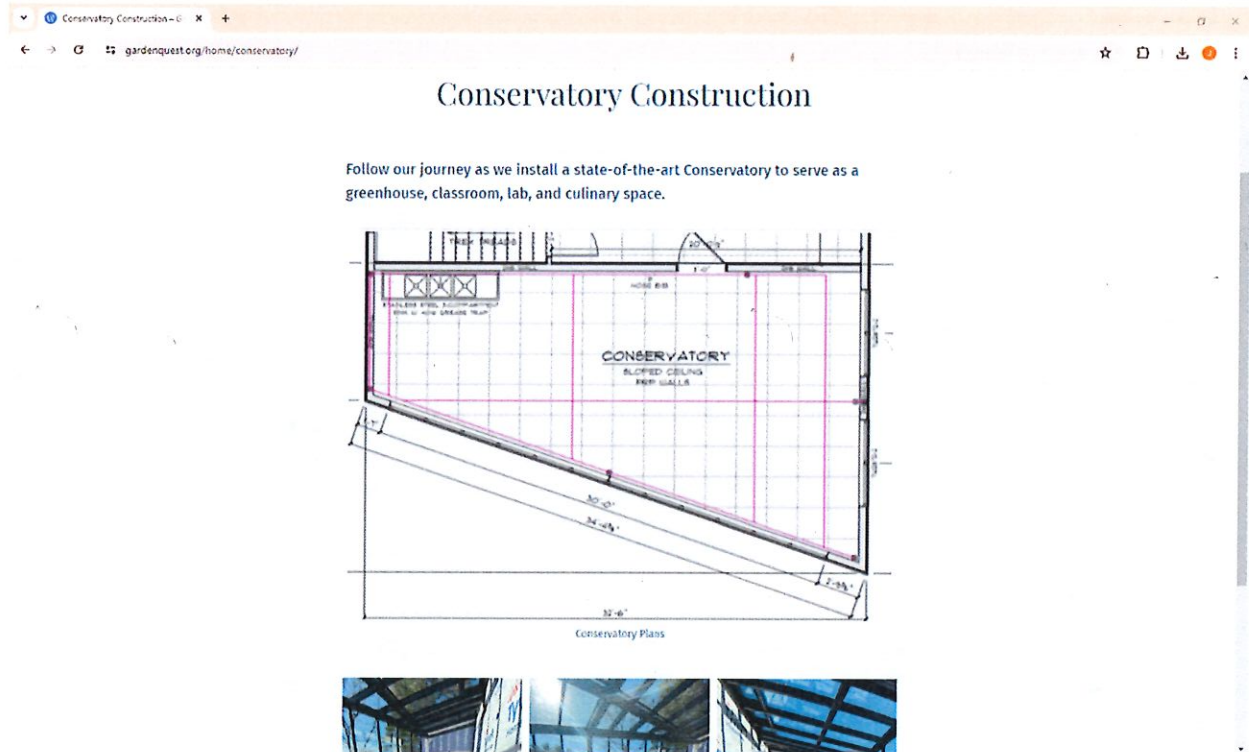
Screenshot taken from the GardenQuest website on 05/06/2024, stating the intended use of the newly constructed addition at 2110 E Covenant Drive to be a “Conservatory to serve as a greenhouse, classroom, lab, and culinary space”.
